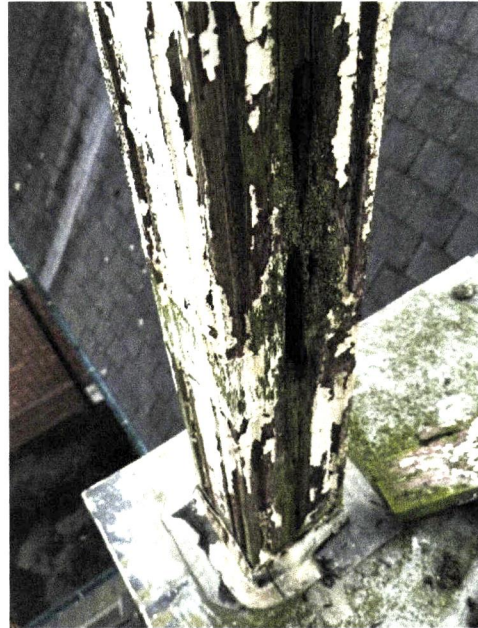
Missing decorative timber and rot noticeable on timber behind
